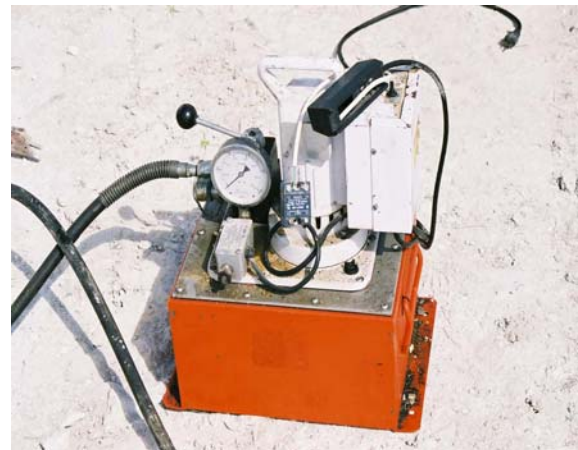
Prestressing Jack and Hydraulic Pump.
